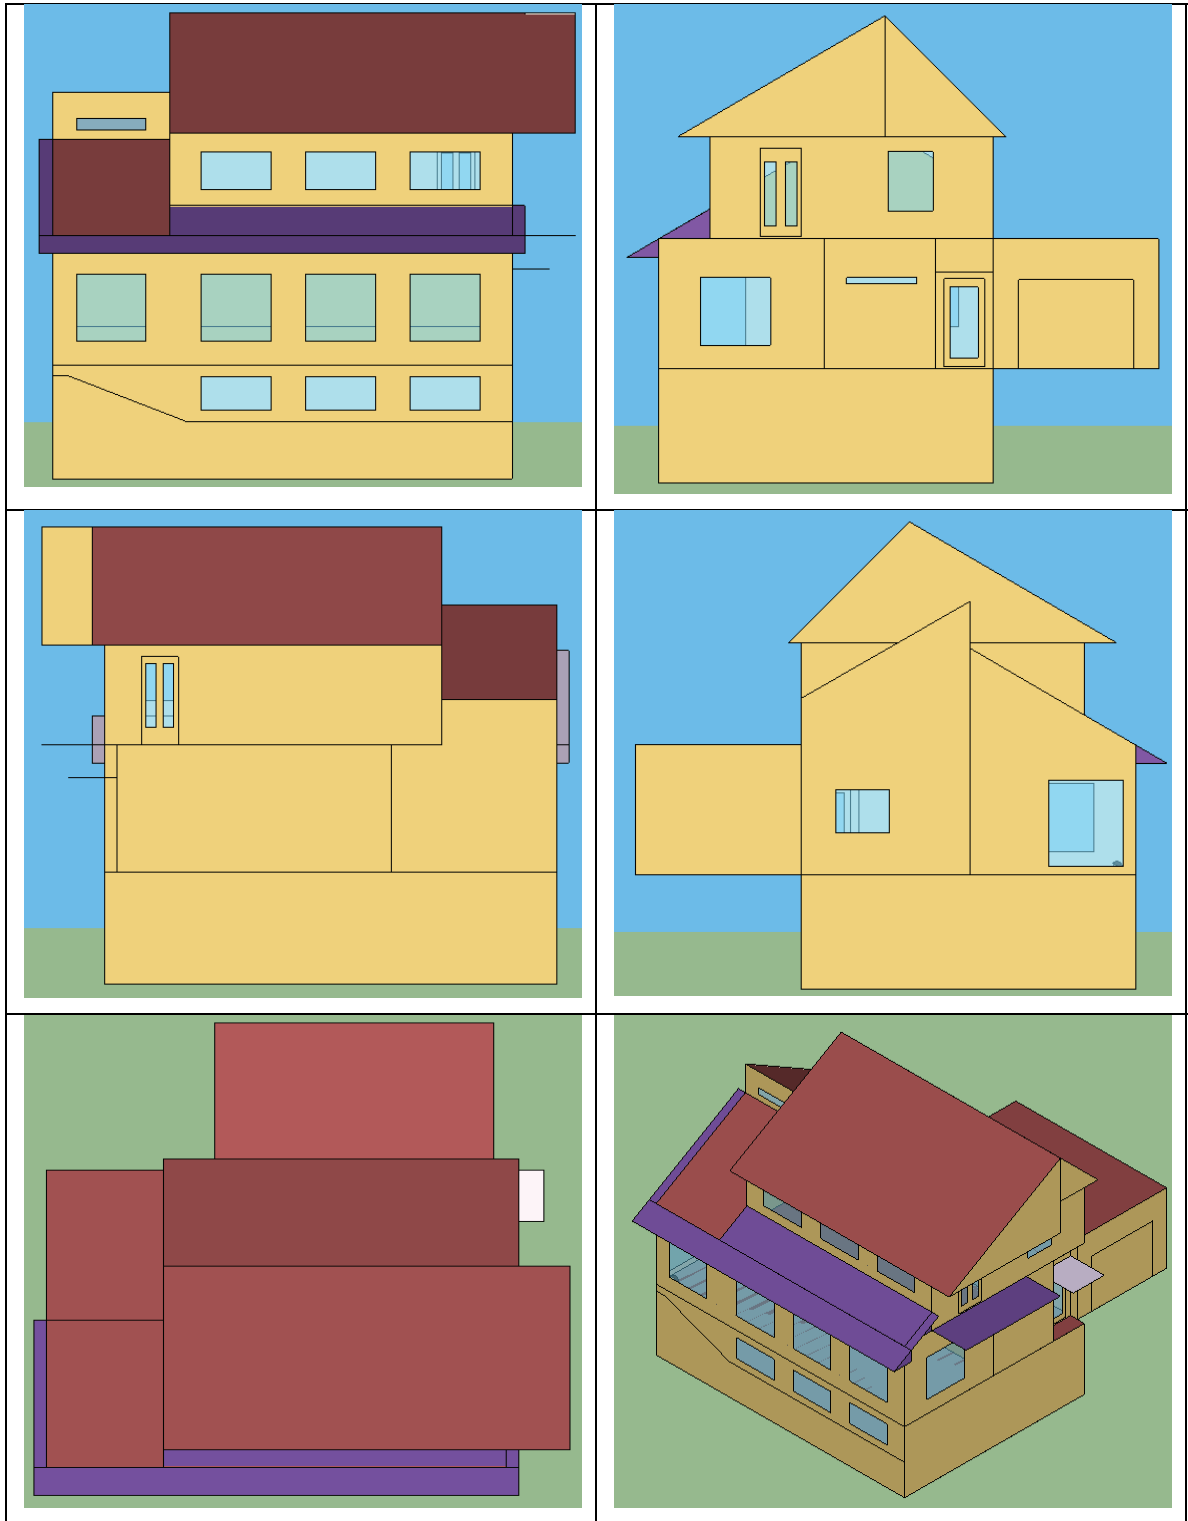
Views of model clockwise from top-left: south elevation, east elevation, west elevation, isometric, plan, and north elevation.
